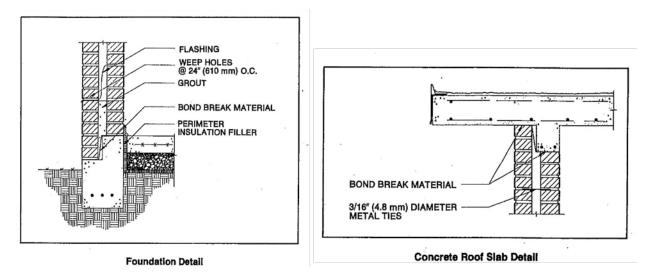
Concrete Masonry Details: Technical Notes on Brick Construction
